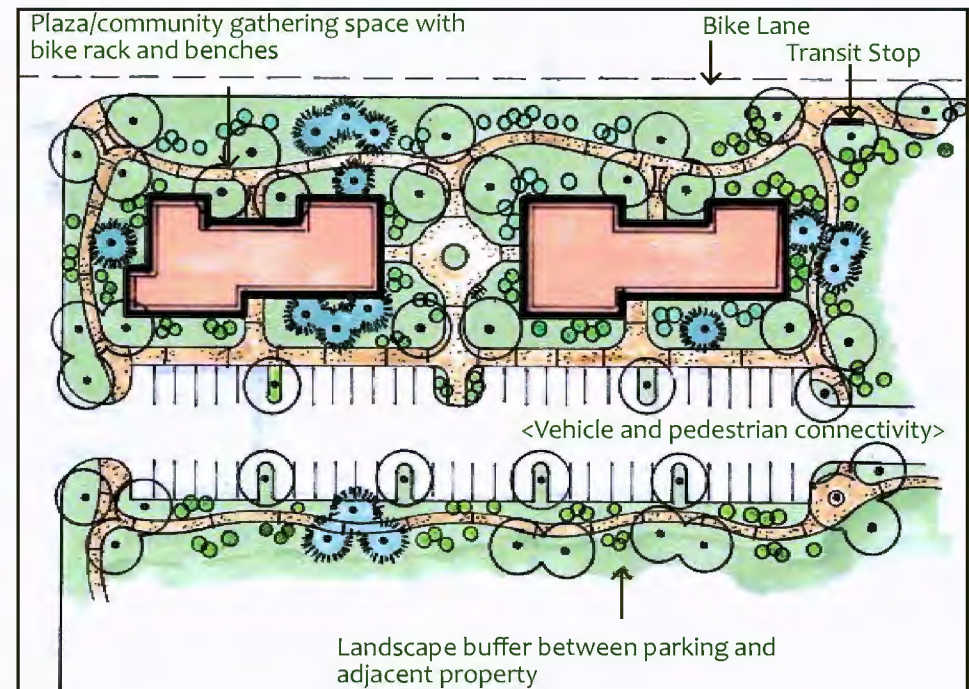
Site concept incorporating design elements of walkability and accessibility for all modes of transportation.
